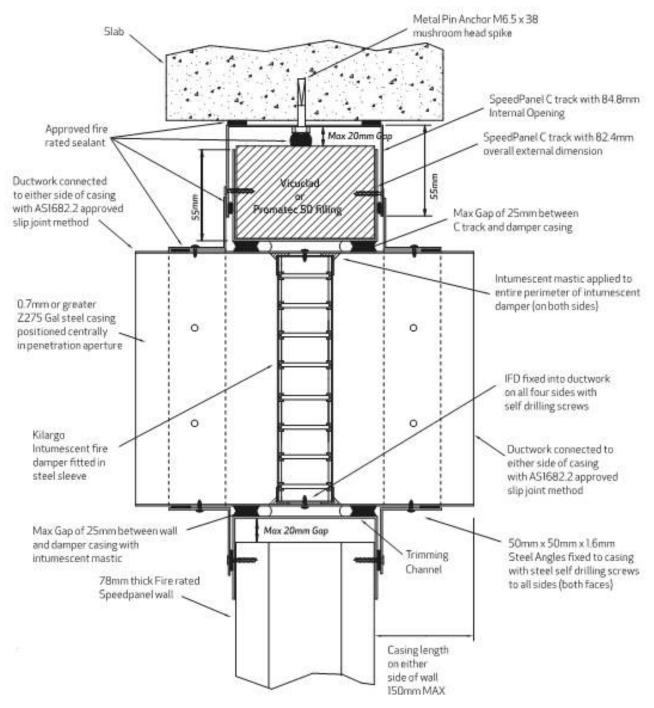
Example of a Kilagro Fire Damper in a Speedpanel Wall
